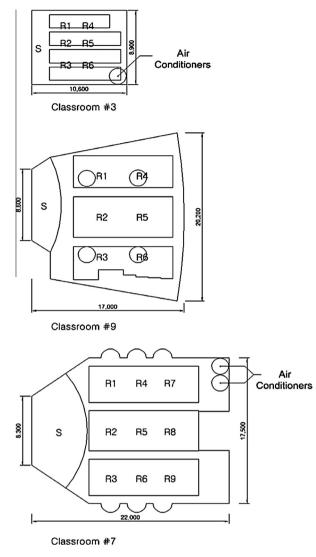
Floor plans of three classrooms: #3, #9, and #7, of the 12 university classrooms.
